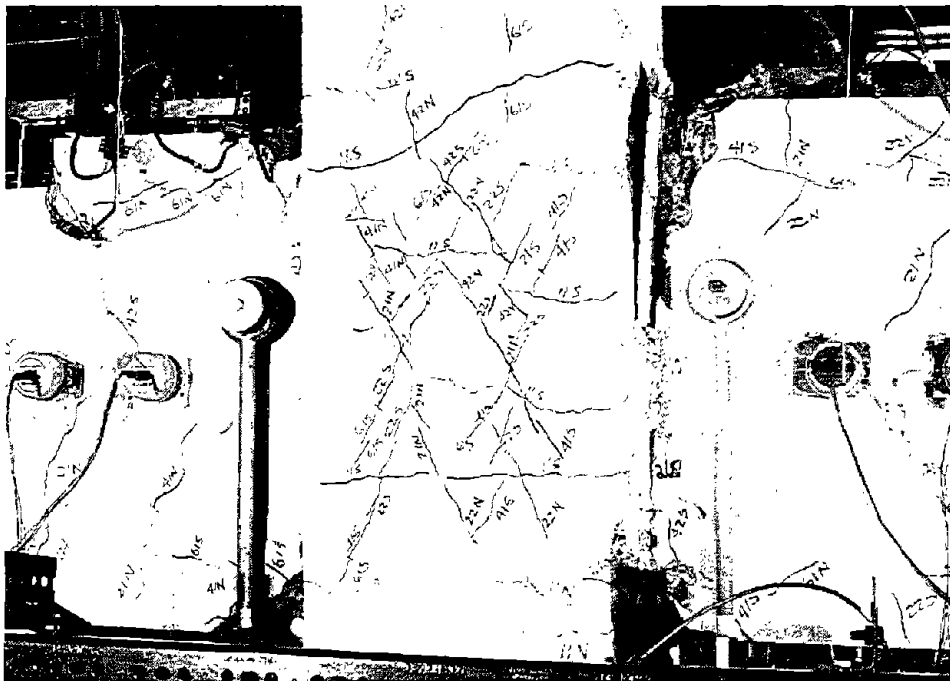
Specimen K-P-Z4 at failure - story drift = 3.1%.
